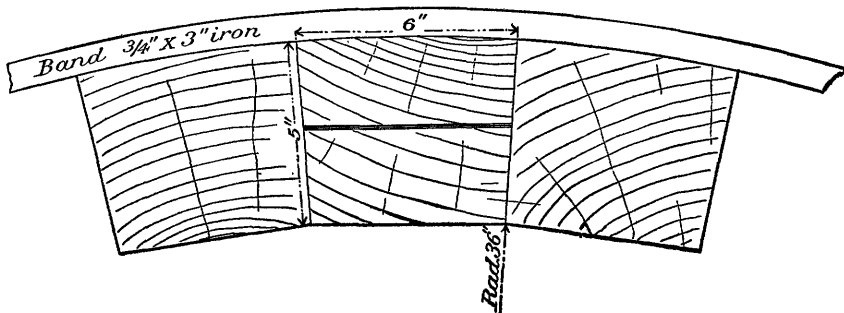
Section of stave pipe used in wooden conduit of Toronto waterworks.
